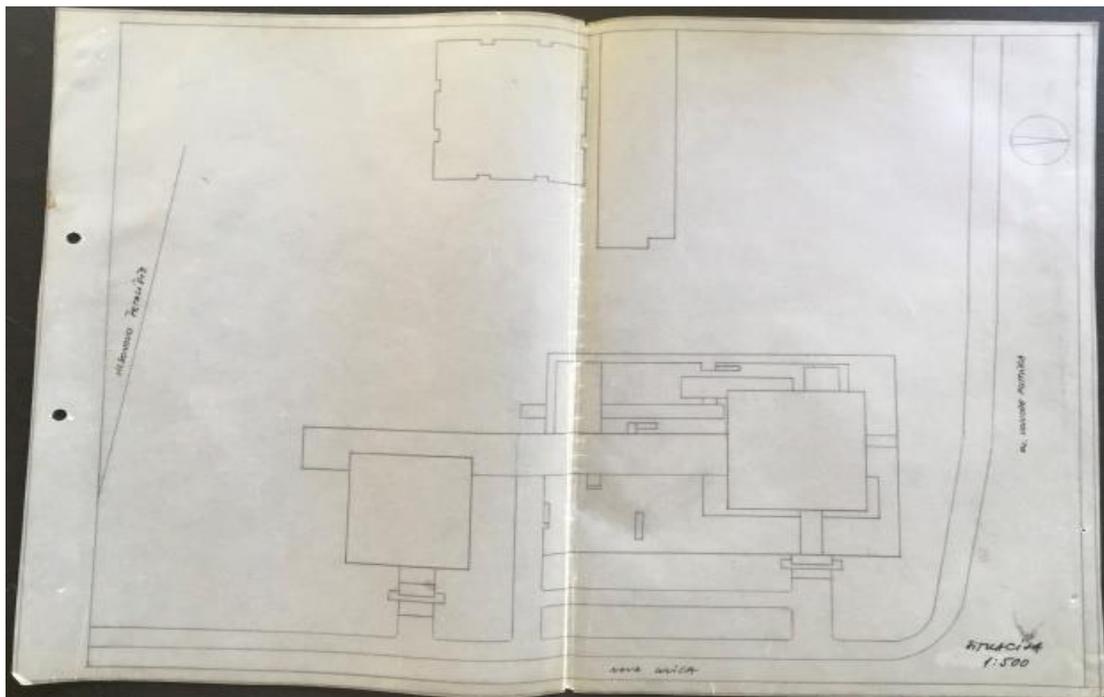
Unsigned drawings: proposed Site plan of the Museum with a second Cube (Author's photo from the HMBiH Archive).
